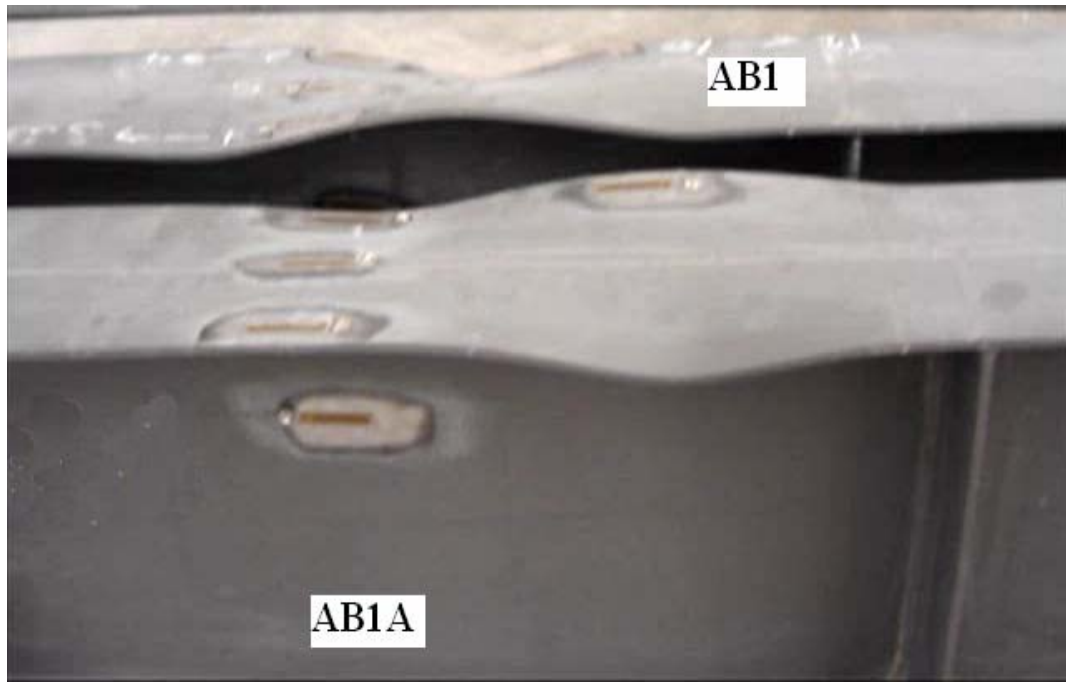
Typical Wave shapes for Beams AB1 and AB1A at Collapse dition.
